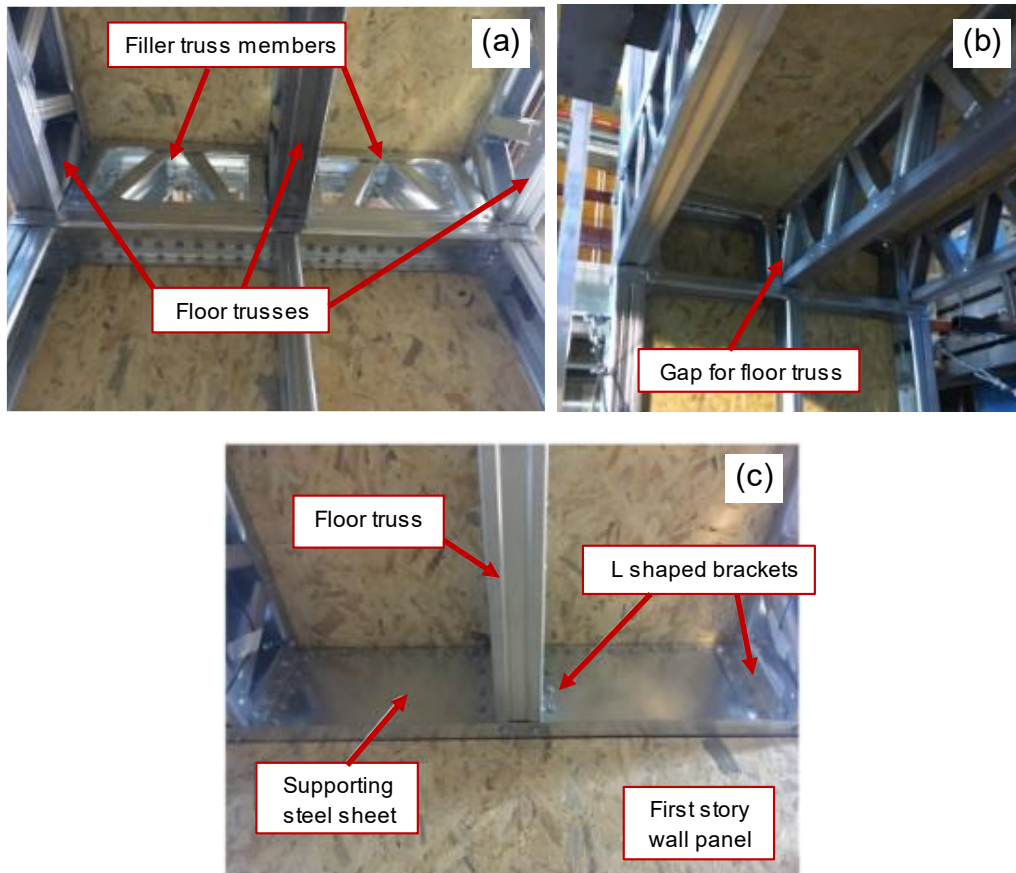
Details of different floor framings: (a) platform framing detail-1; (b) platform framing detail-2; (c) ledger framing
